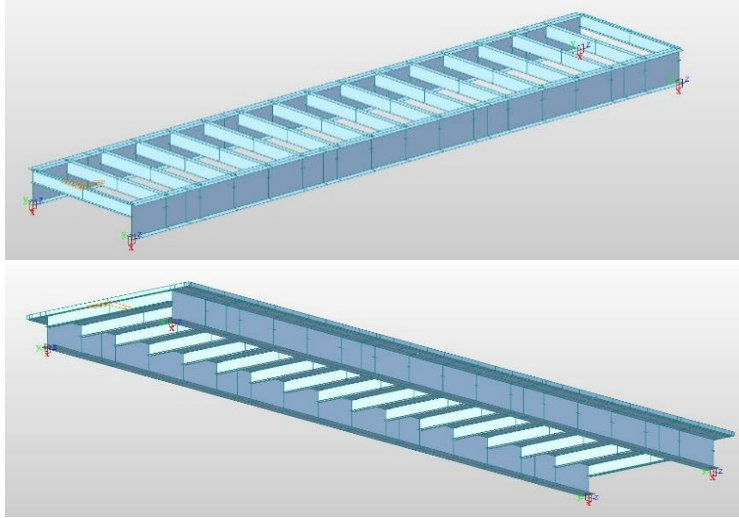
Ladder deck 40m bare steel section during construction and completed composite structure.
